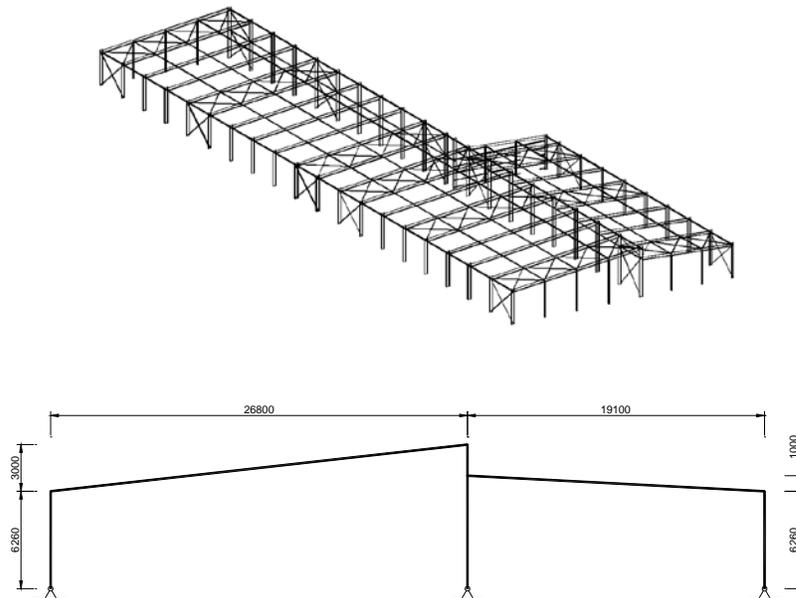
MFRO building structure (dimensions in mm). 3D model of the structure (top) and a typical portal frame (bottom).
